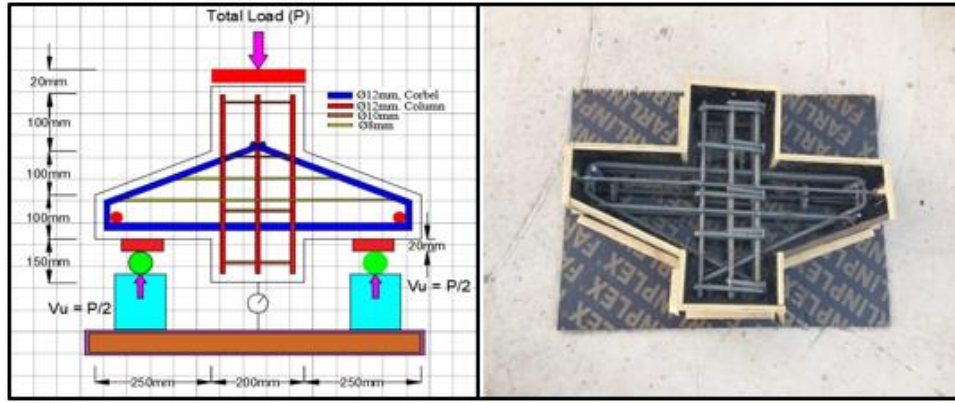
The Reinforcement Details and Dimensions of R.C Corbels.
